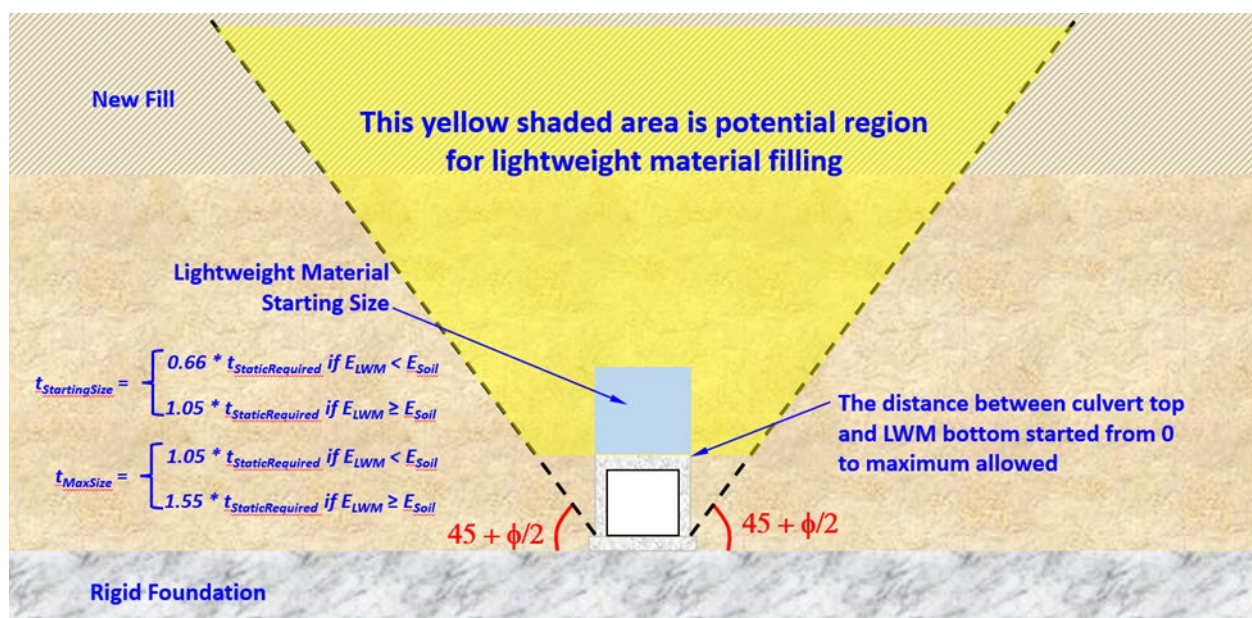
Initial Size and Positioning of LWM Layer Atop the Culvert
